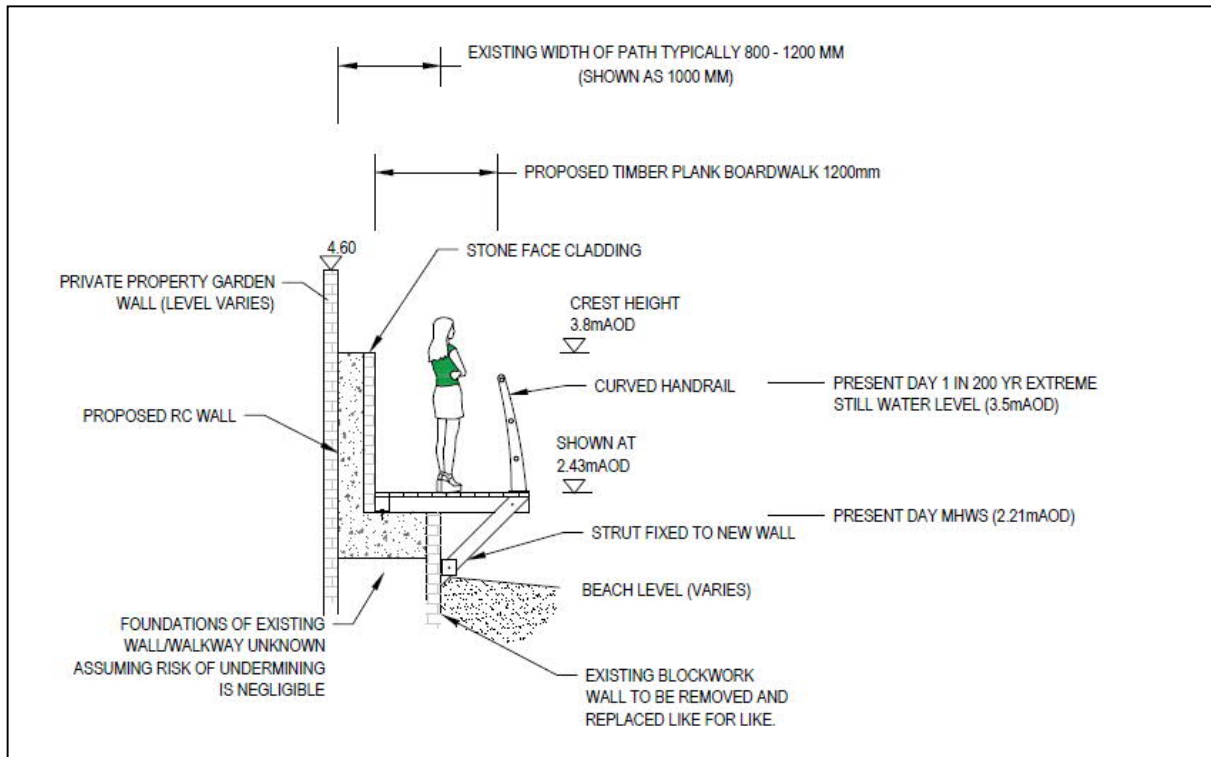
Sketch of indicative boardwalk and floodwall cross section in ODUs 3f-h, using strut to fix boardwalk to new wall (not to scale).
